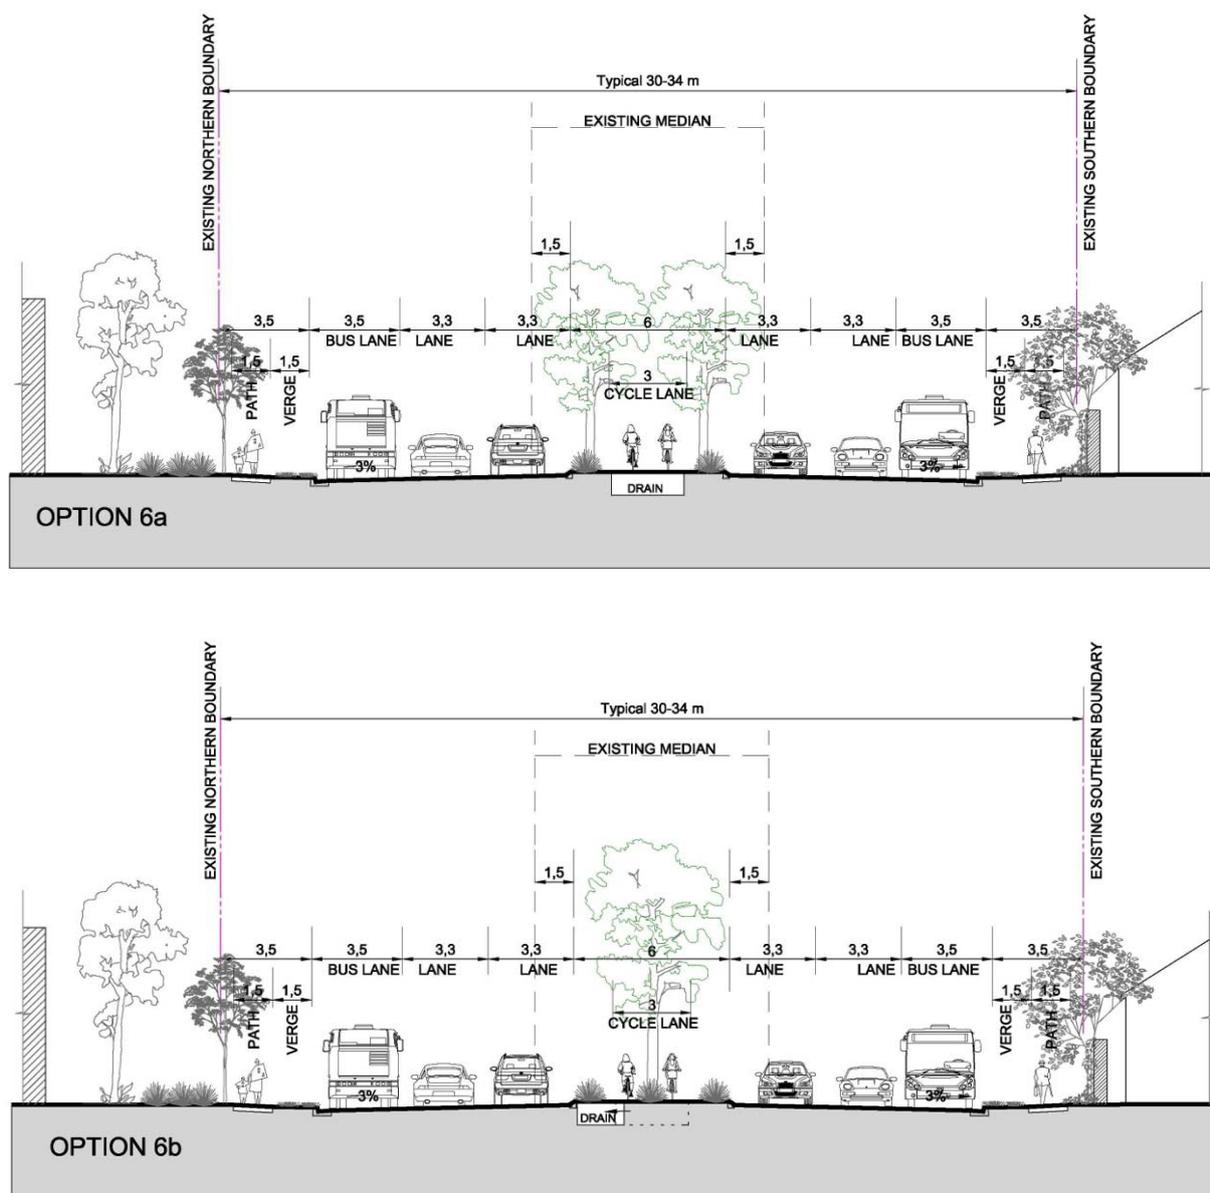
Norwest Boulevard road corridor design options, in cross-section
